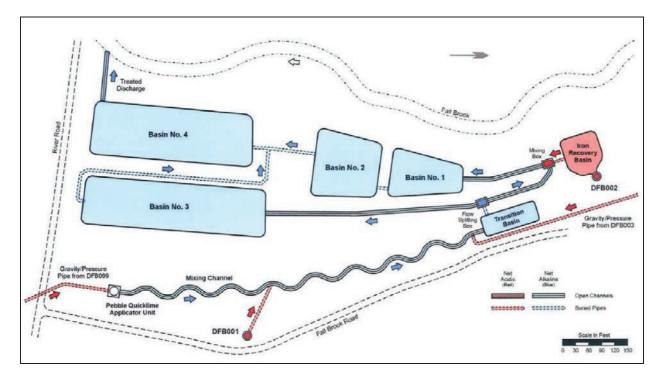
Fall Brook AMD Chemical Treatment Plant Project Site Plan
